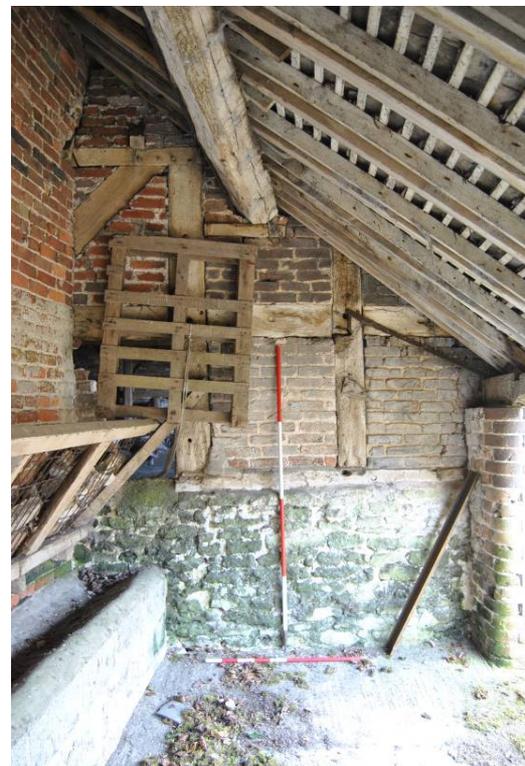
Shelter shed E looking west, timber-framing of Building F.
